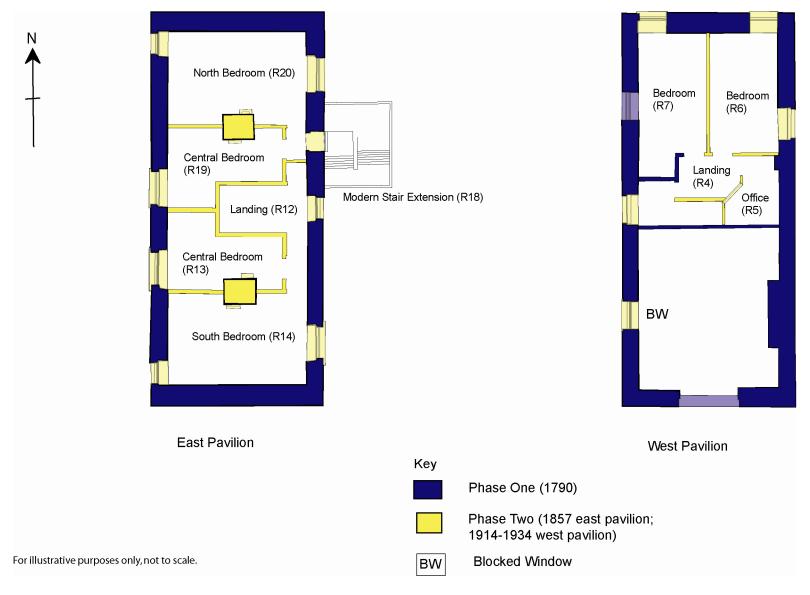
First floor phased plans of the East and West Pavilions (not to scale)
